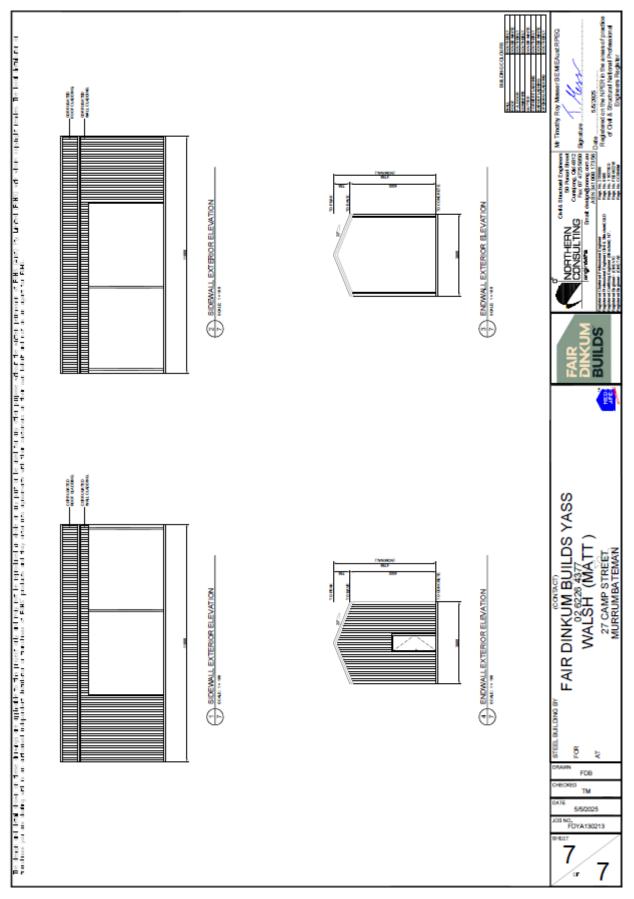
Elevations Plan (Source: Fair Dinkum Builds and Northern Consulting Engineers, May 2025)
